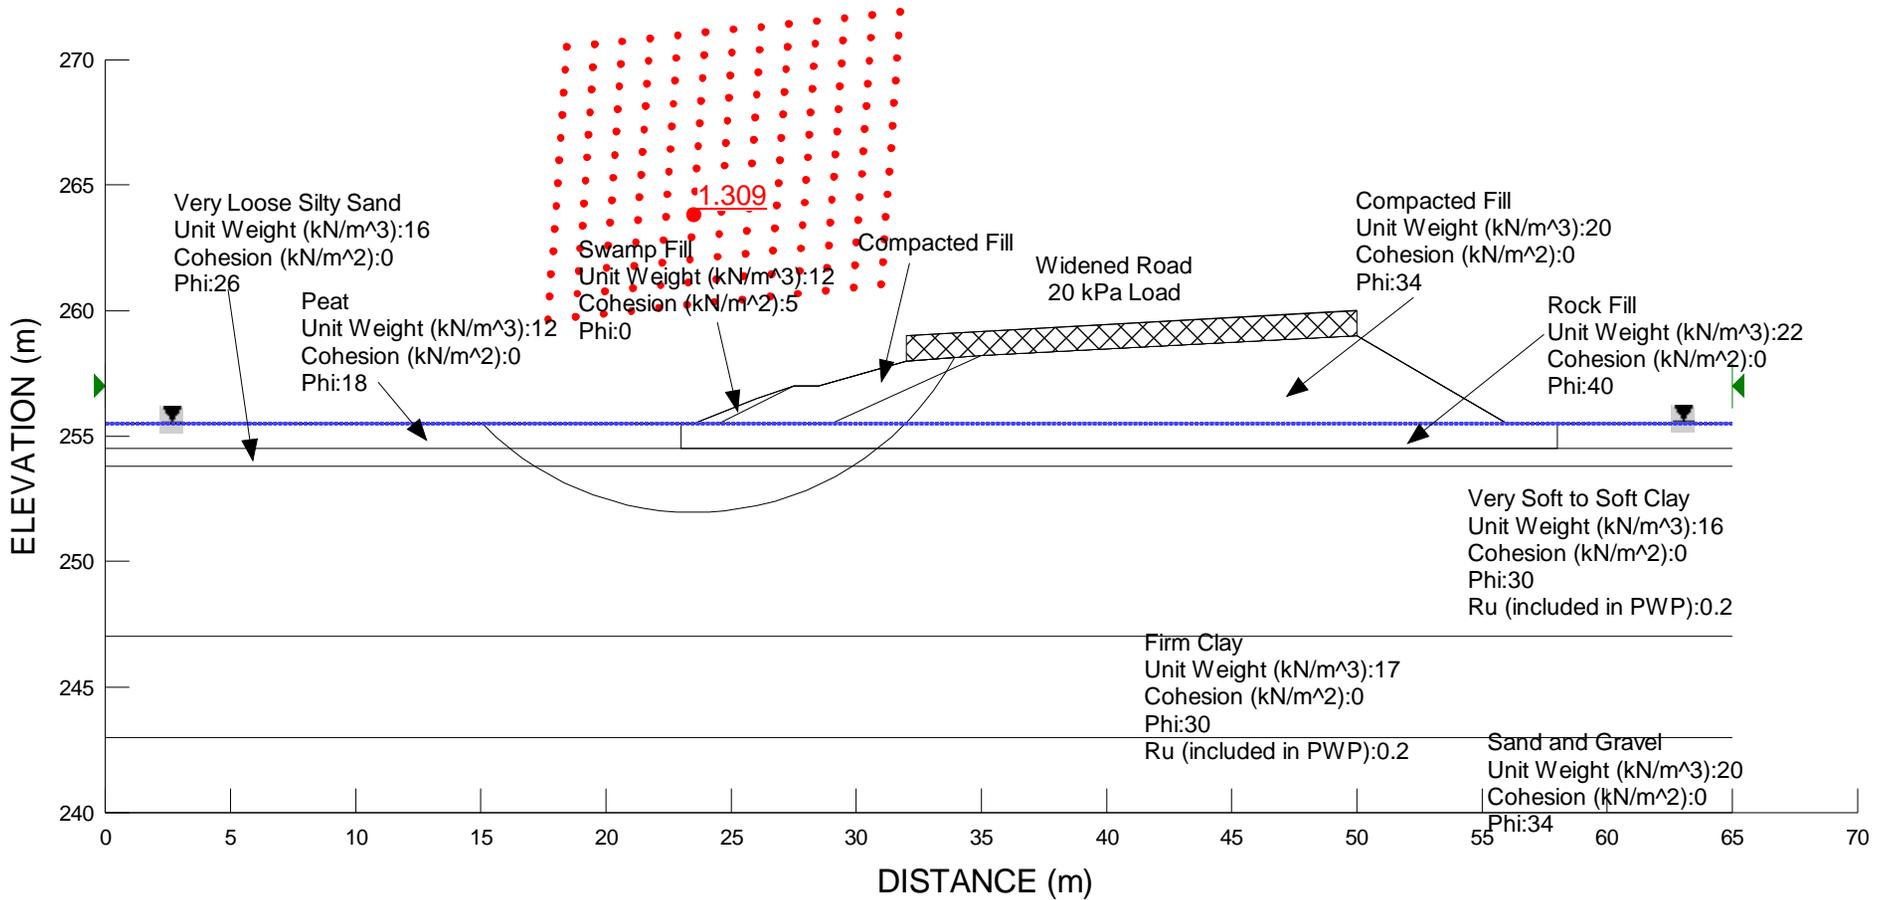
Slope Stability Analysis of Section at Station 19+100 with 3.0 m Road Widening (Long Term Analysis)
